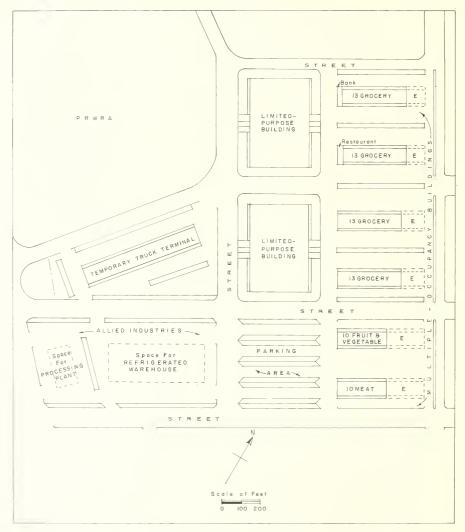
Layout of the proposed facilities on the Puerto Nuevo site, San Juan, P.R.
